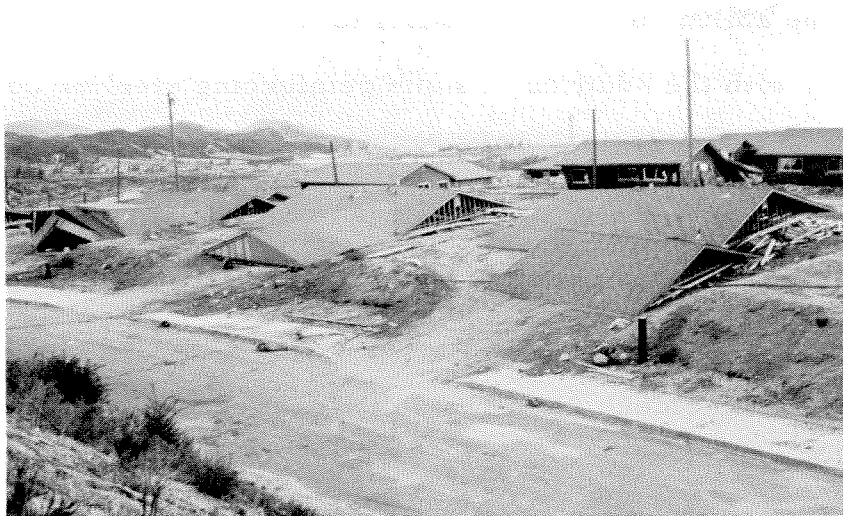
Heavily damaged and collapsed residential houses under construction, east of Veterans Administration Hospital.
